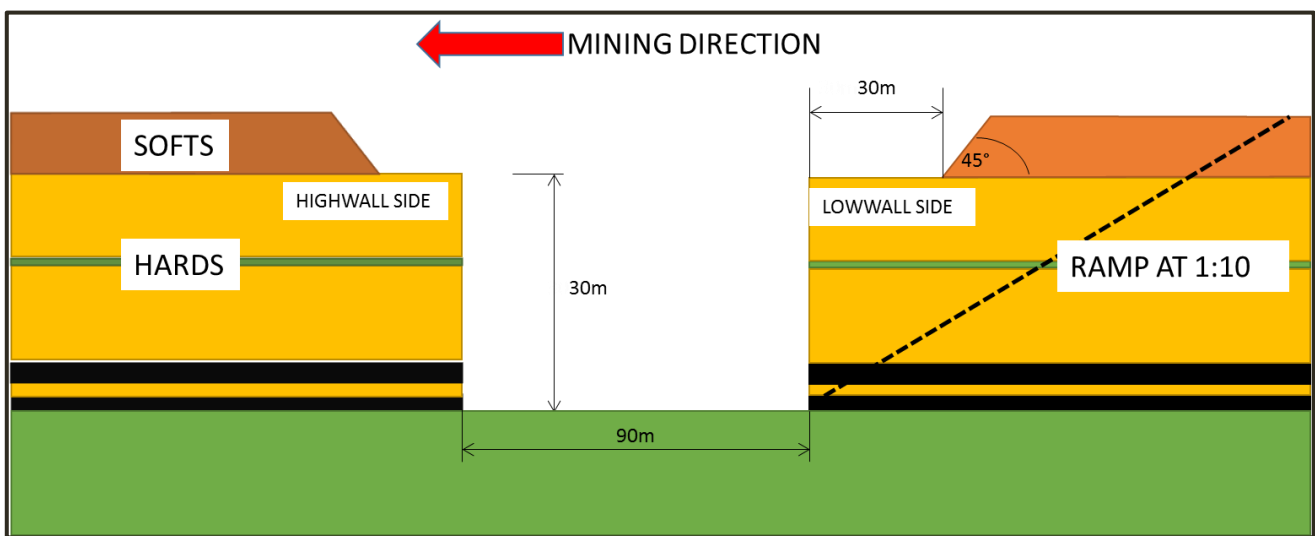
Schematic Section through Box cut looking North (Mindset, 2013)
